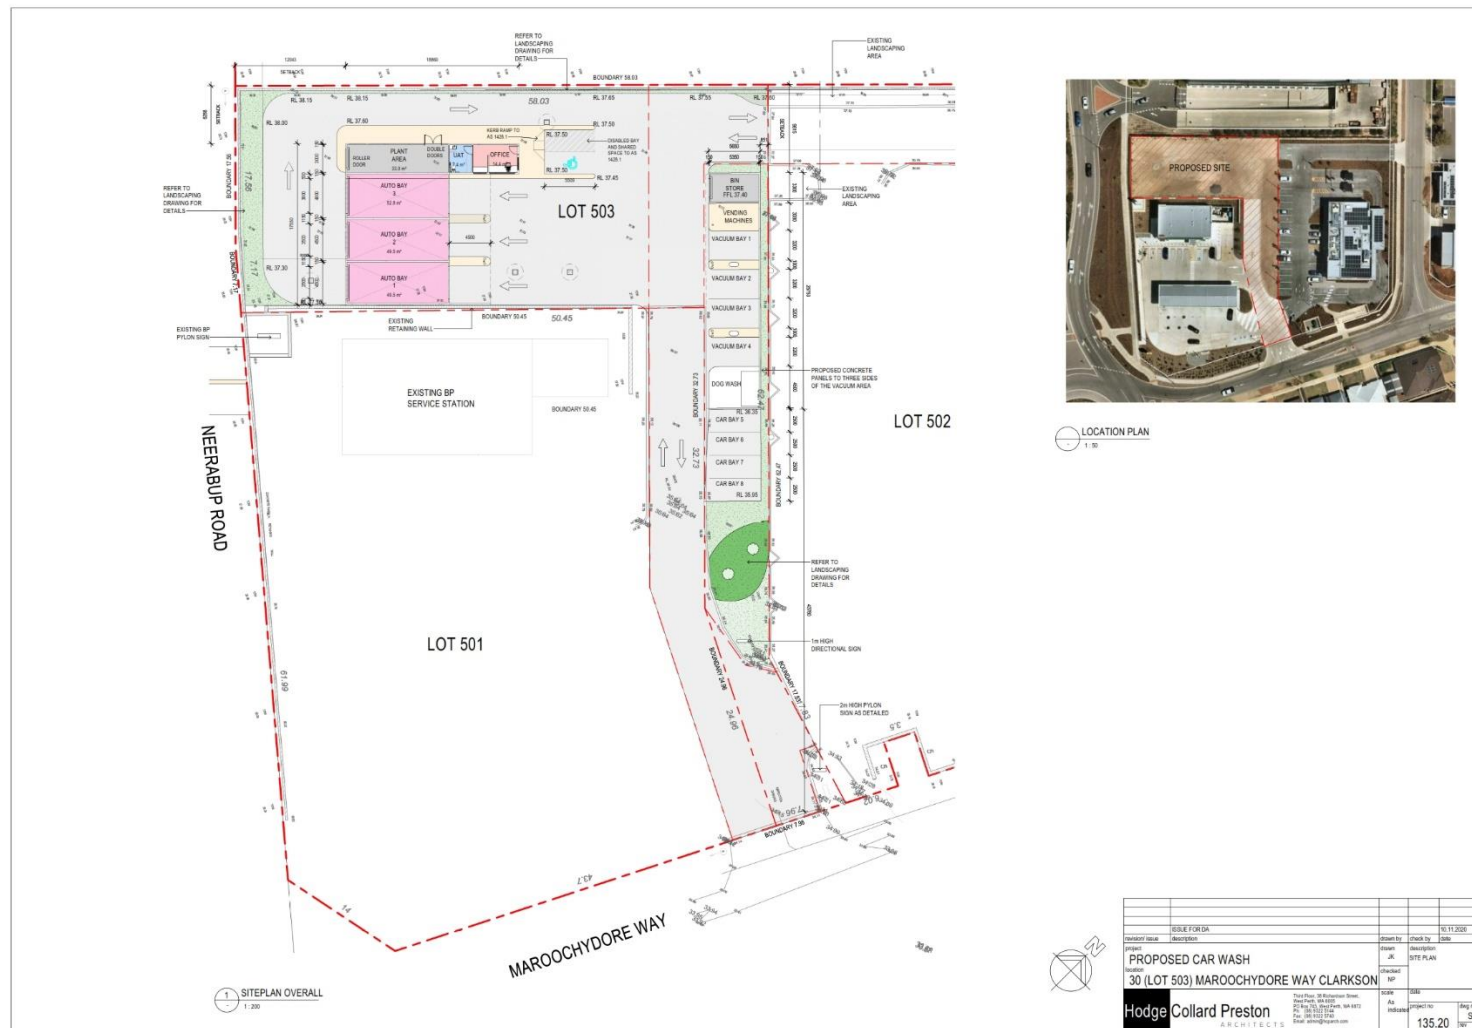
Site Plan (source: Hodge Collard Preston)
